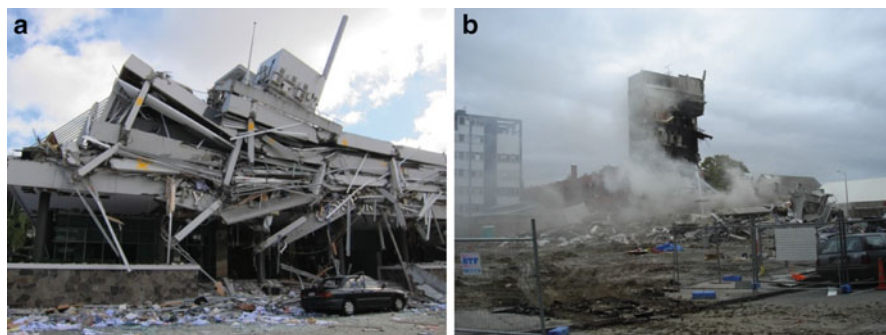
Collapsed buildings (a) Pyne Gould building; (b) CTV building
